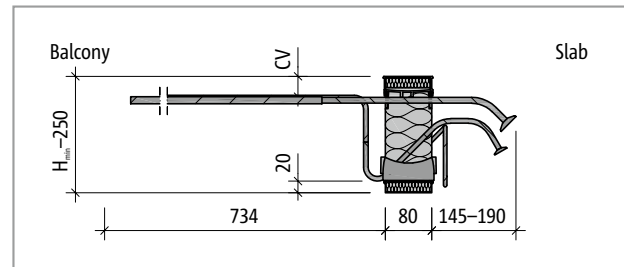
Schöck Isokorb® T type K-O-M4: Product section
